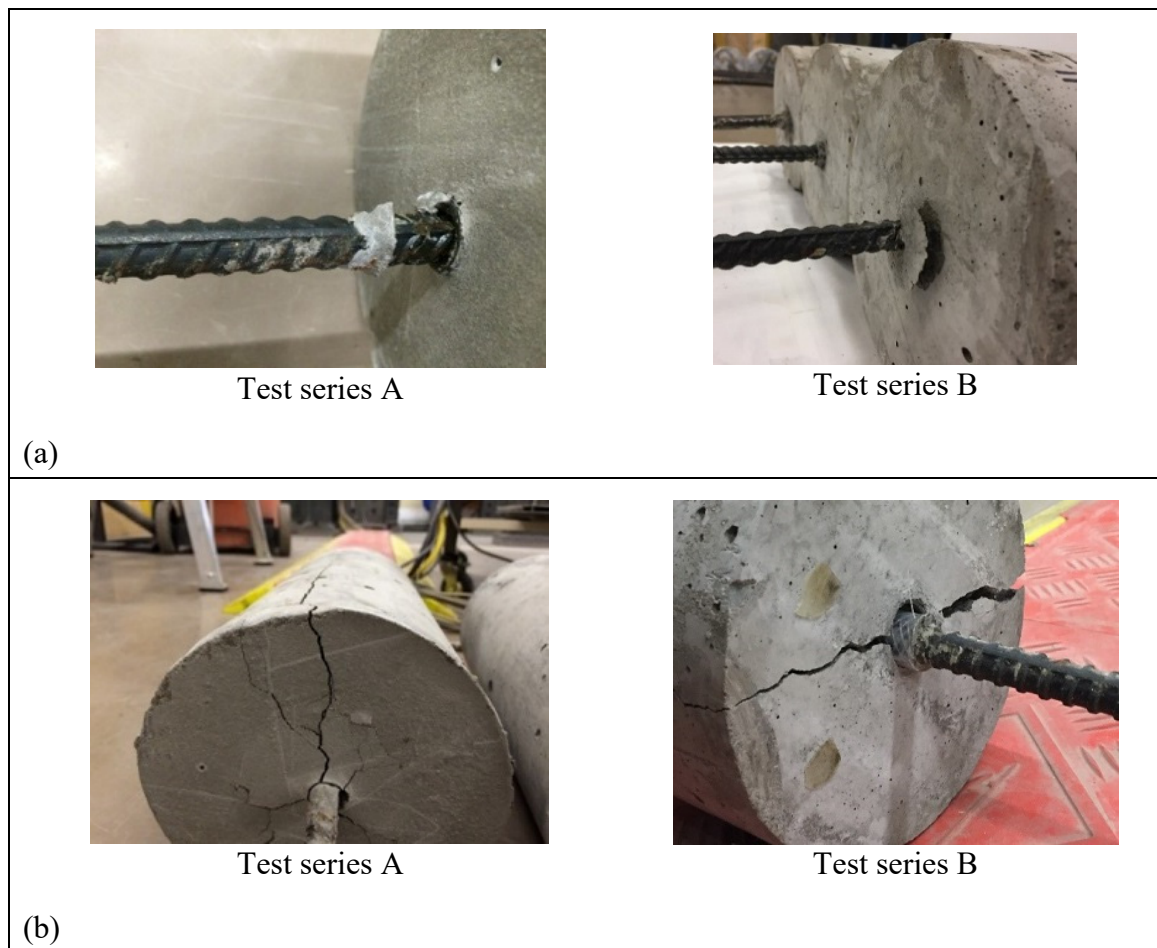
Failure modes: (a) pull-out failure; (b) splitting failure
